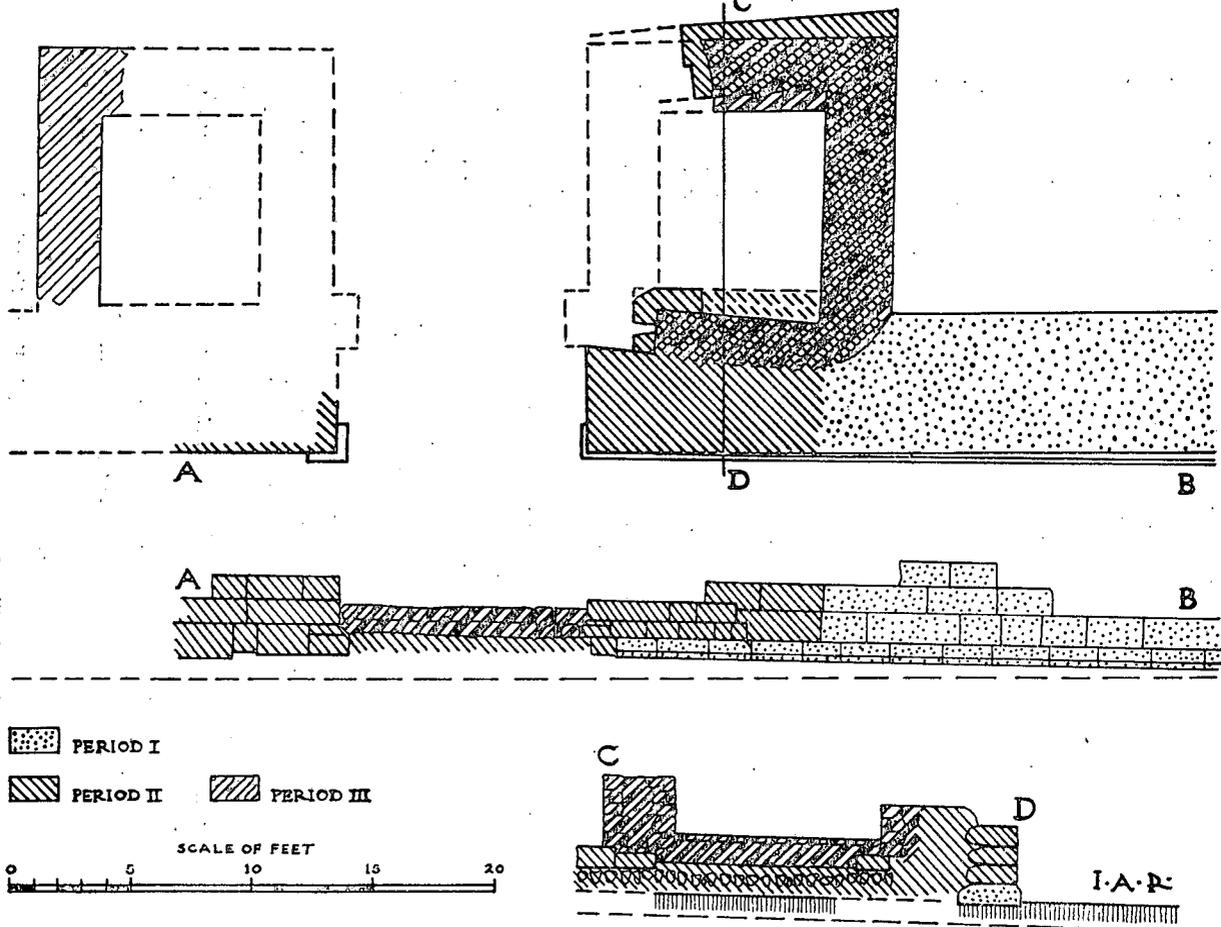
WEST GATE AT RISINGHAM, PLAN AND SECTIONS.
